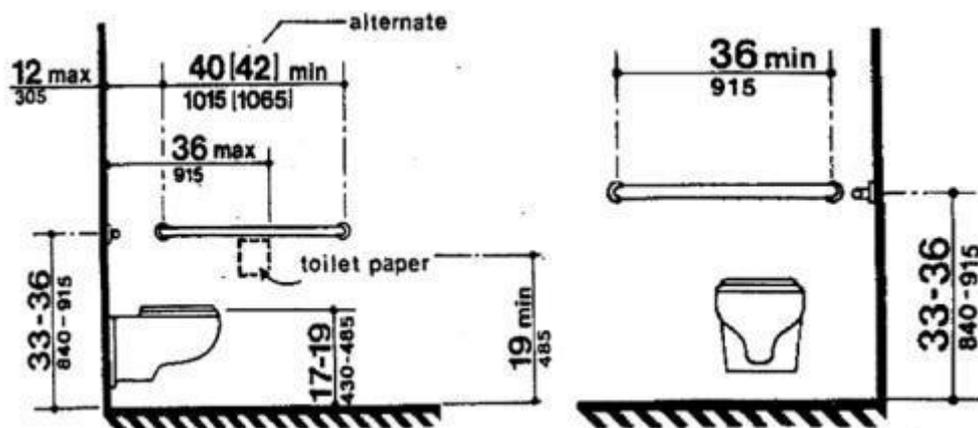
Layout of an accessible restroom [P GAC 120-3-20-.27, 1987, pg. 66]
